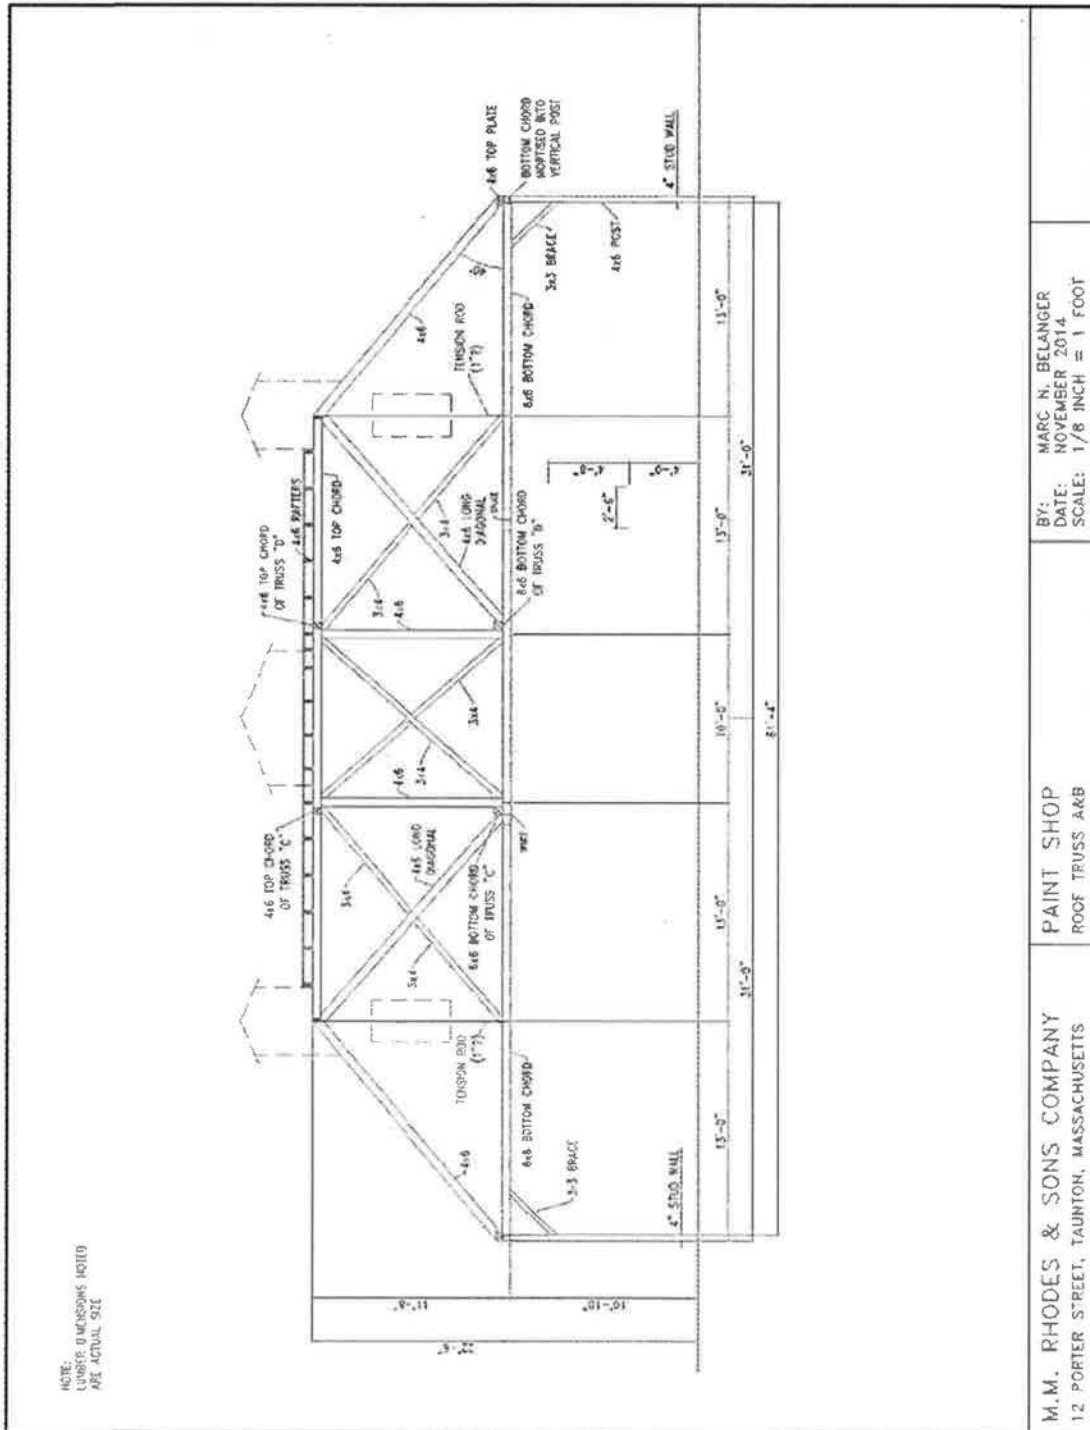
Measured Drawing, Paint Shop Roof Framing, Truss A & B.
